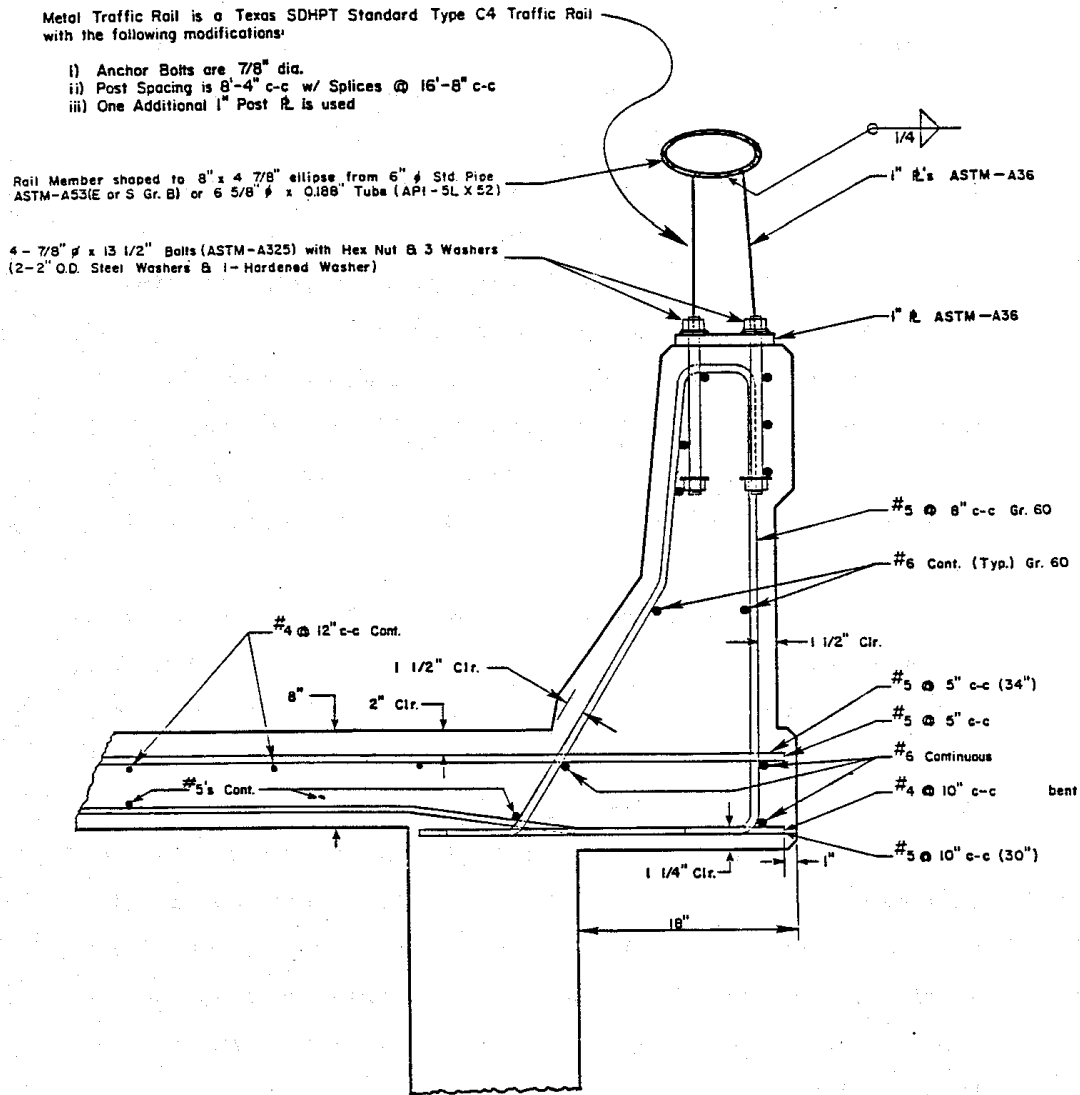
TL-5 Concrete Safety Shape with Metal Rail on Top [17]
